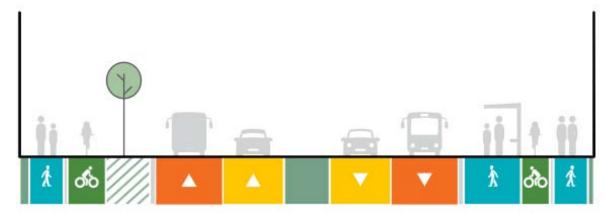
CFAF Outcome - Don Buck Road Indicative 30m cross section
